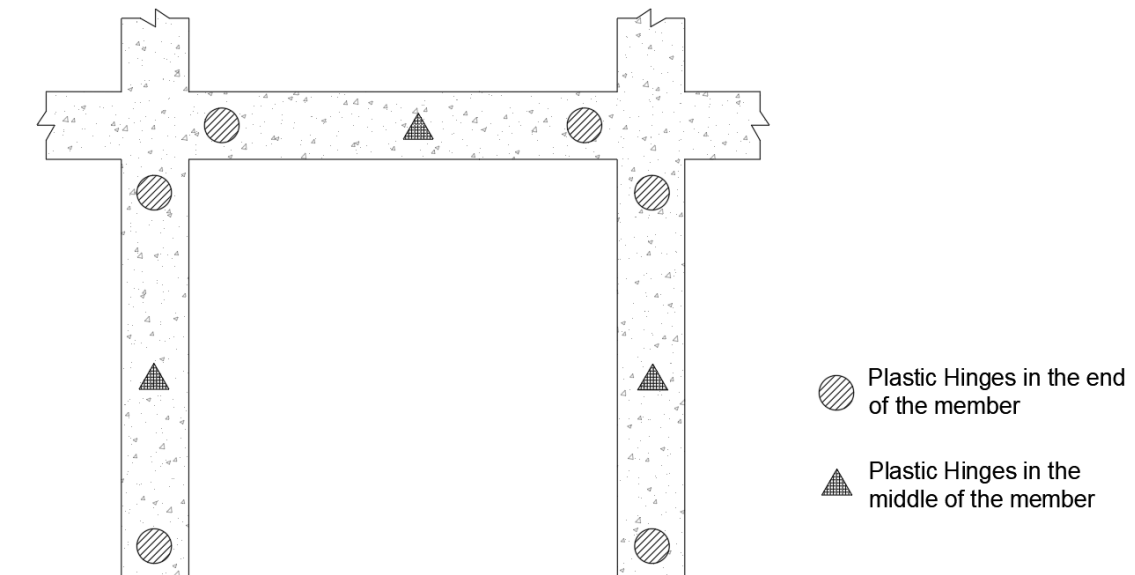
Plastic Hinge Zones assignment for RC beams and columns
